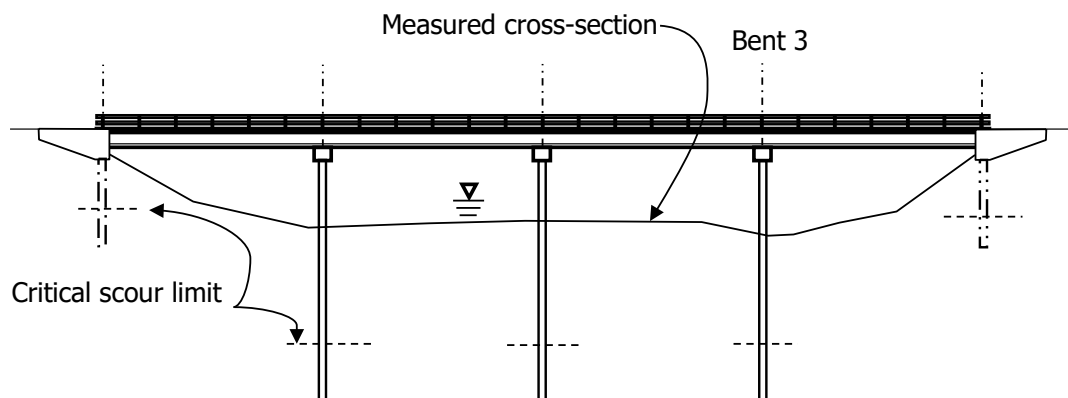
Elevation view showing scour elevations and stream cross-section for a bridge.
